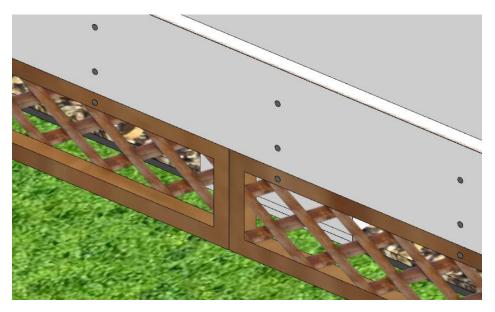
3D sketch showing the nailing patterns of the floor cover layer
